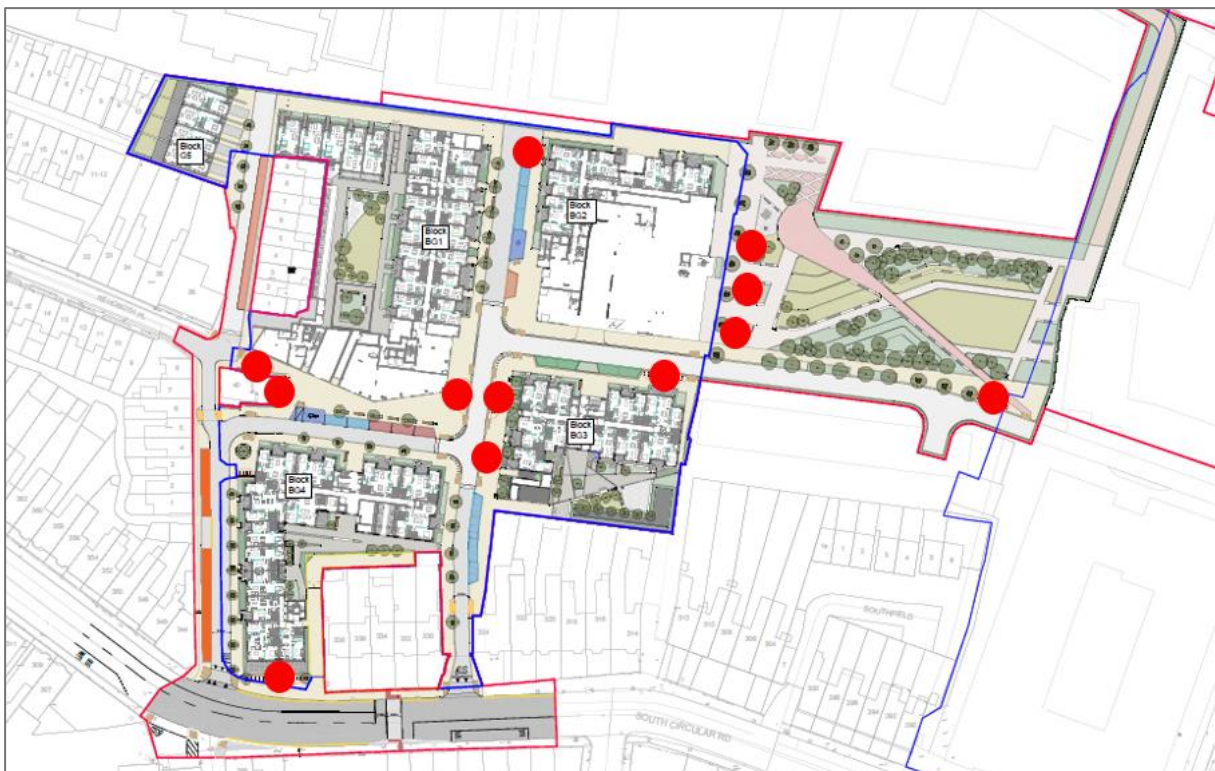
On-Street Parking Locations (SYS-BG-3.1)
